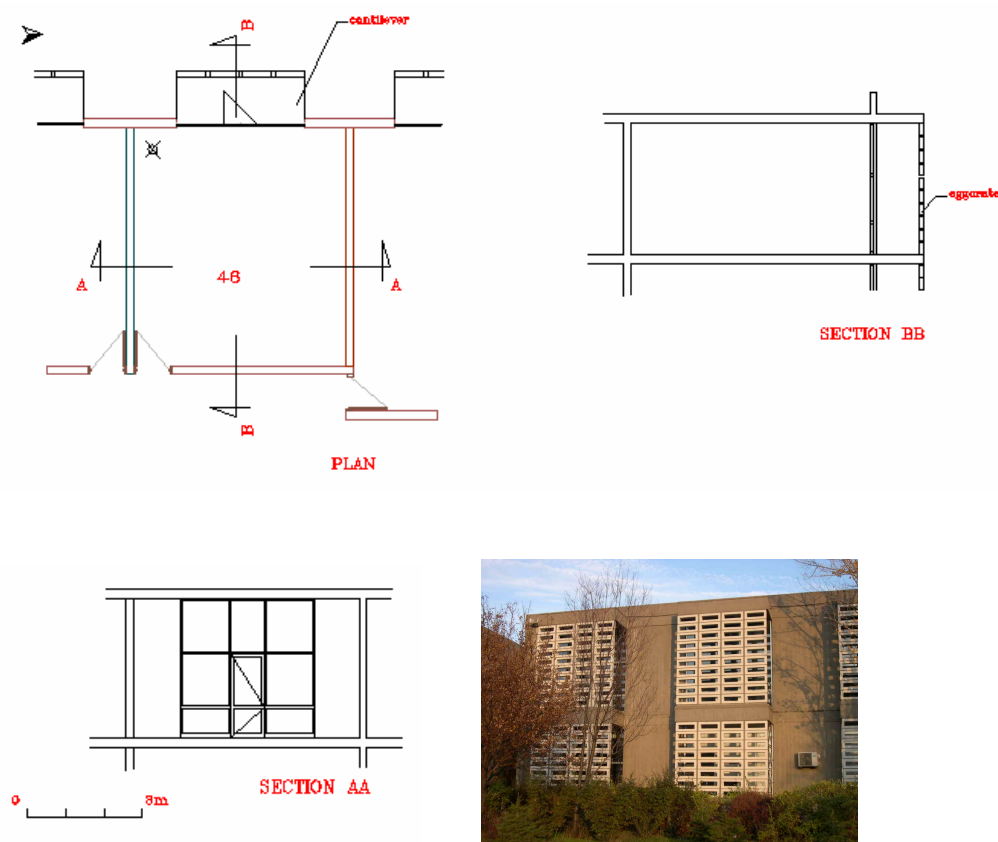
Floor plan, section AA, section BB and exterior view of Room 46.
